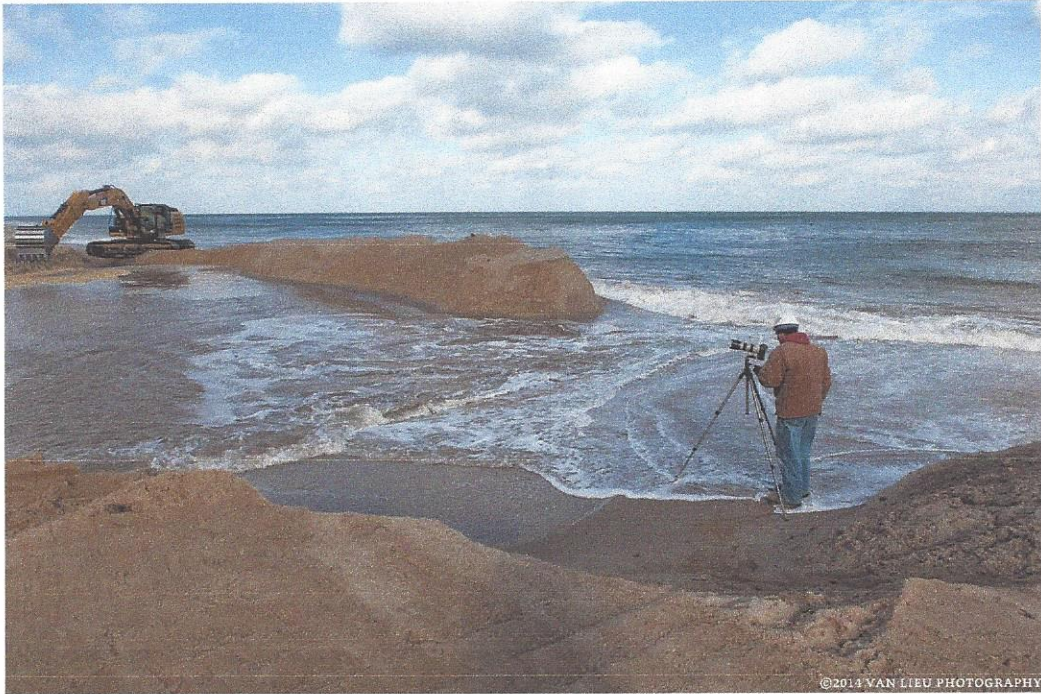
A photograph illustrating the use of an excavated trench in the beach seaward of the geotube revetment with material excavated from the trench piled into a berm. The end of the trench has been excavated through the beach into the Atlantic Ocean allowing the fluidize pump to be completely submerged. Note the calm ocean waters and resulting lack of wave setup and runup.
